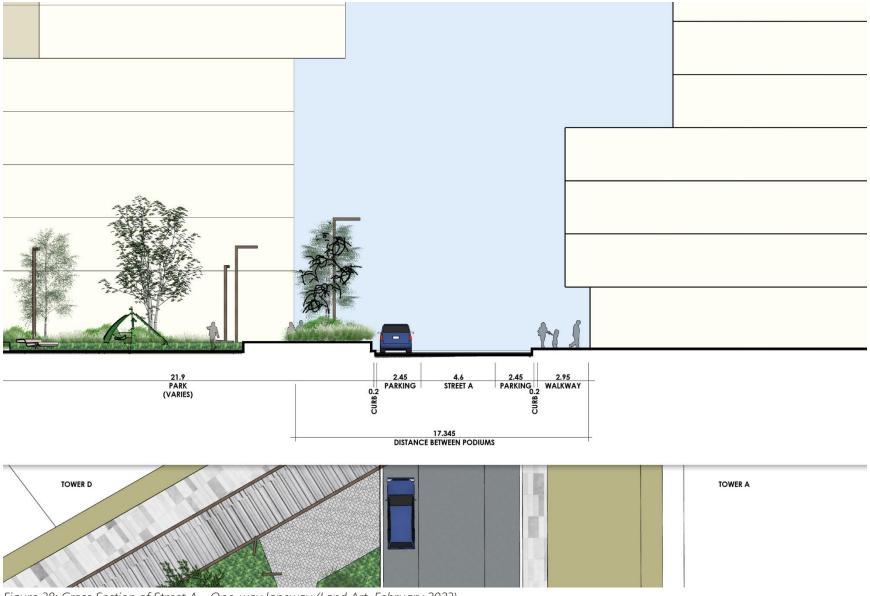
Cross Section of Street A - One-way laneway (Land Art, February 2023)
